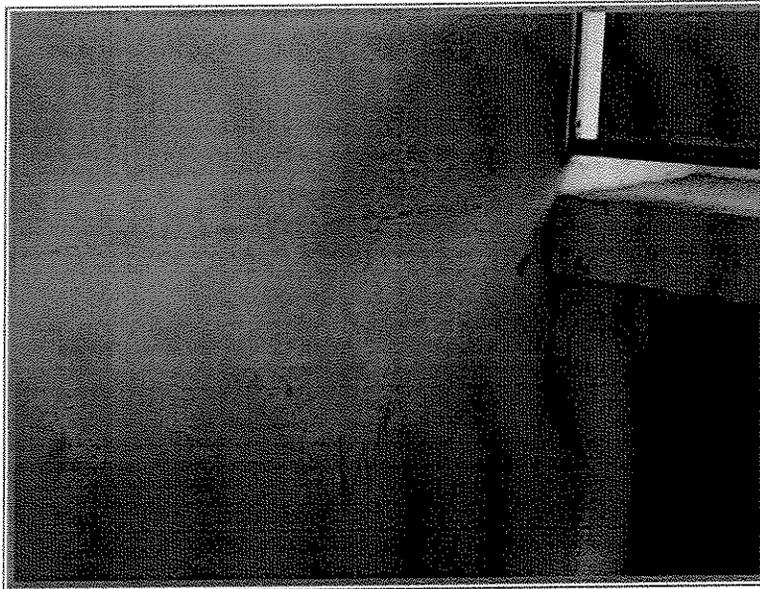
Stair Shaft – Hair line cracks in stair shaft walls
